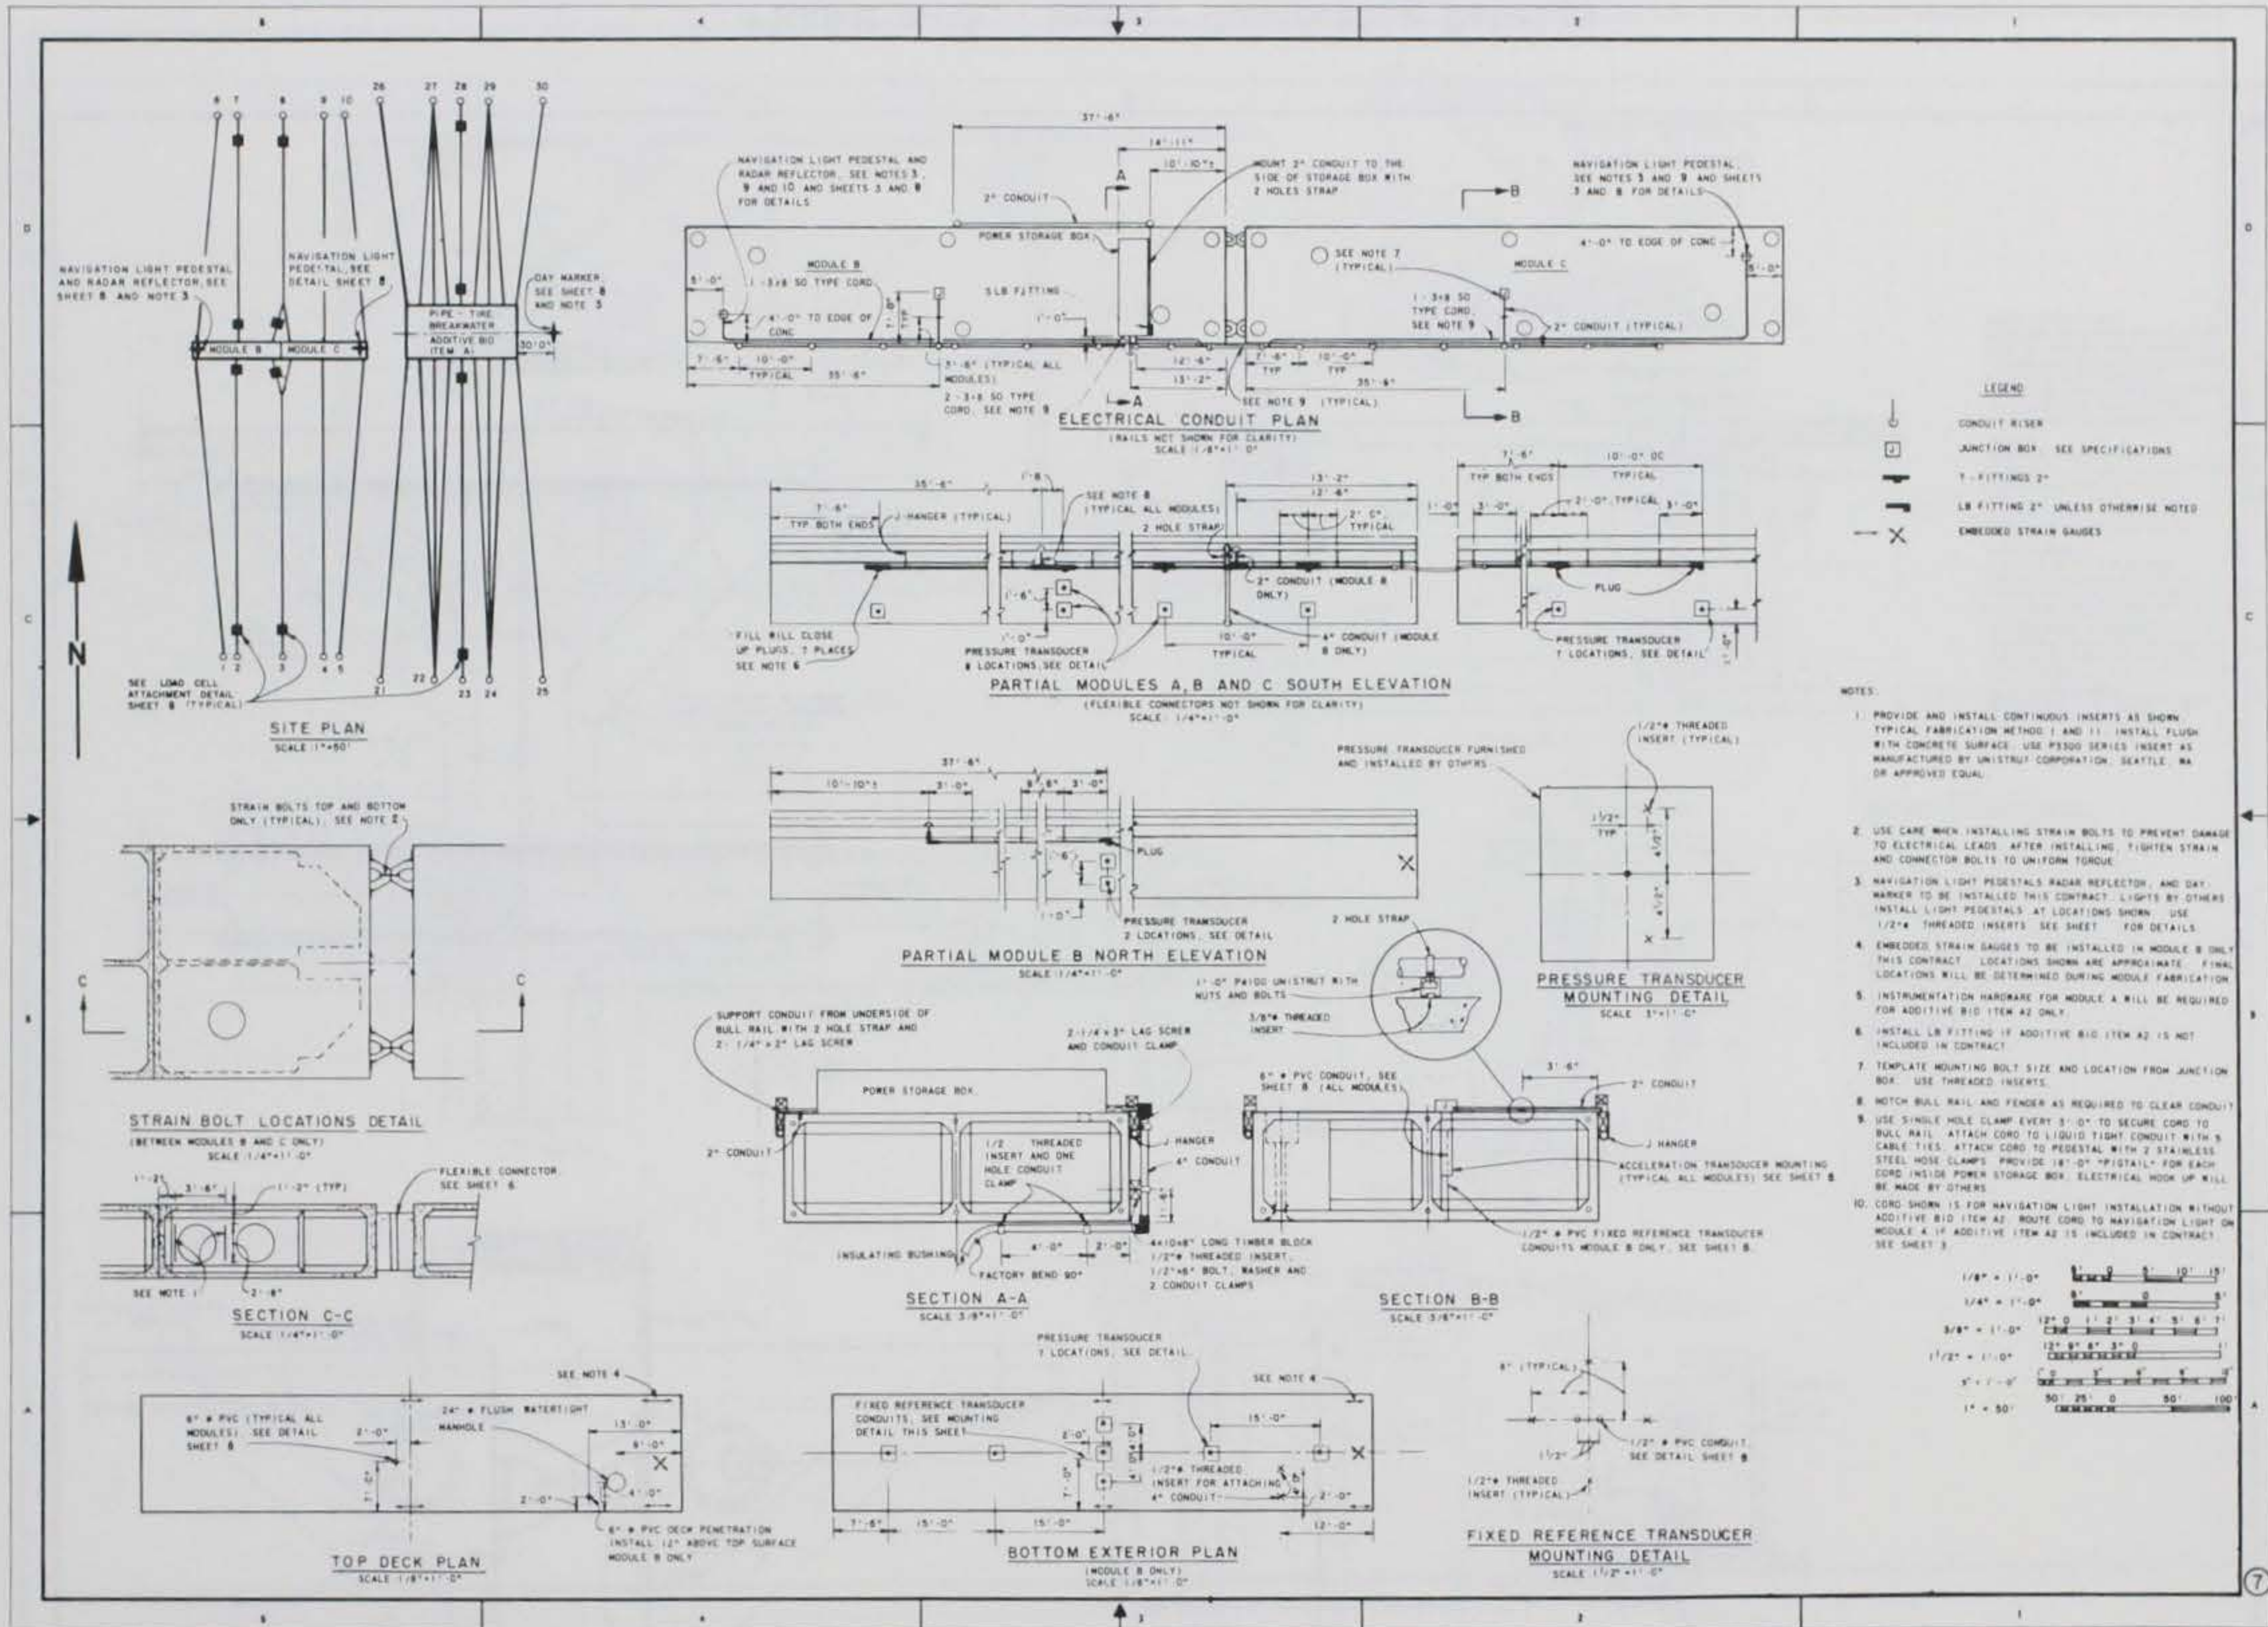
Instrumentation Plans, Sections and Profiles
